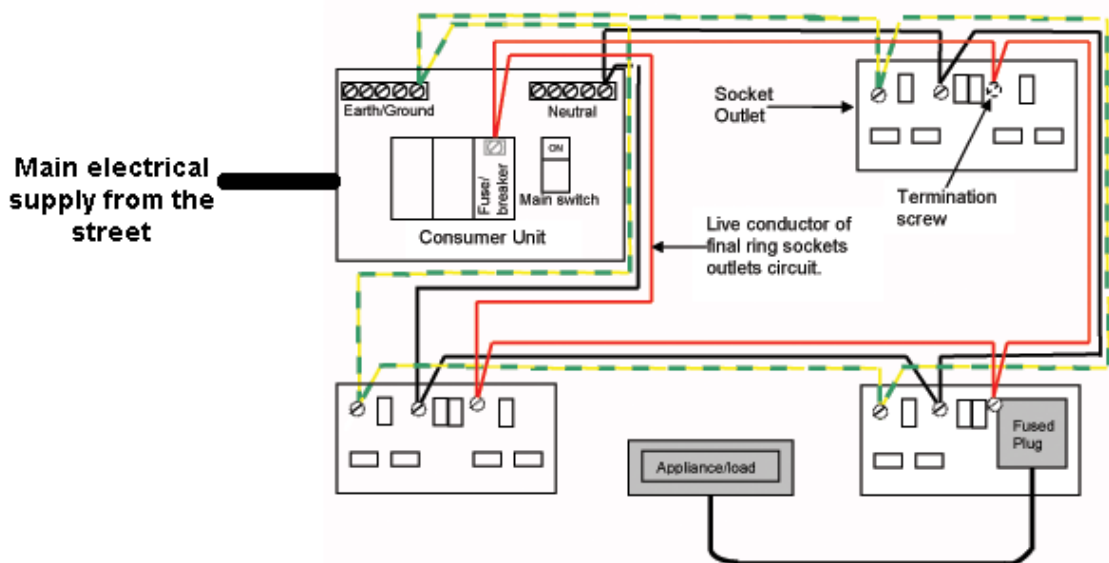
Diagram of a ring circuit used to supply socket outlets. [2]
